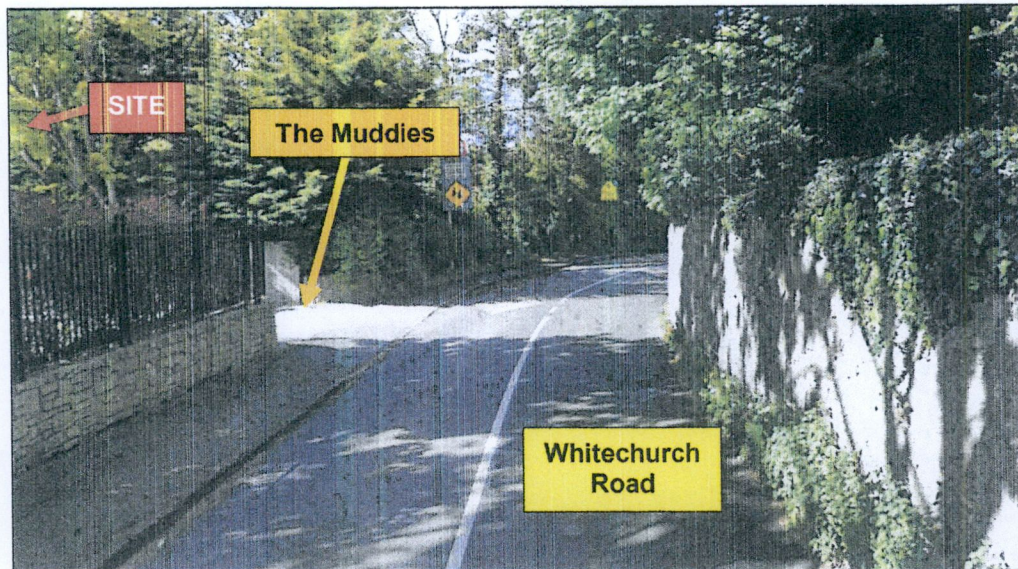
SITE AND SURROUNDING ROAD NETWORK
